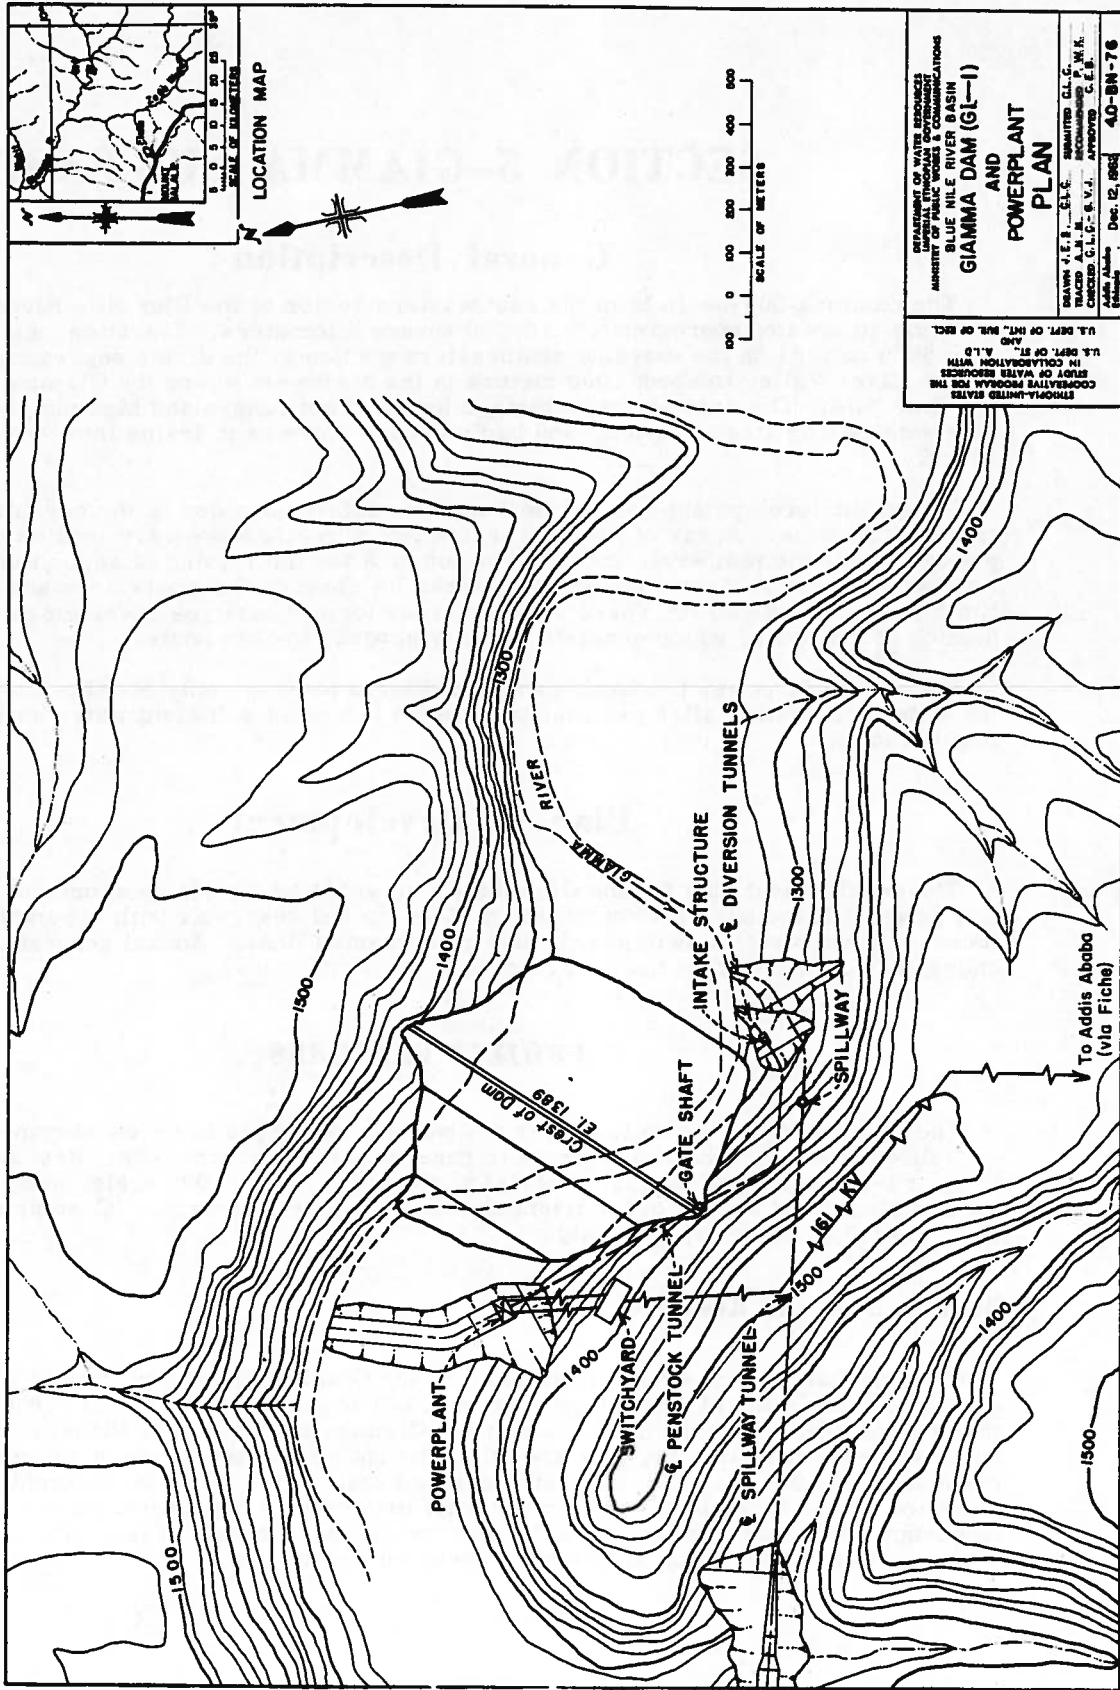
Giamma Dam (GI-1) and Powerplant--Plan
